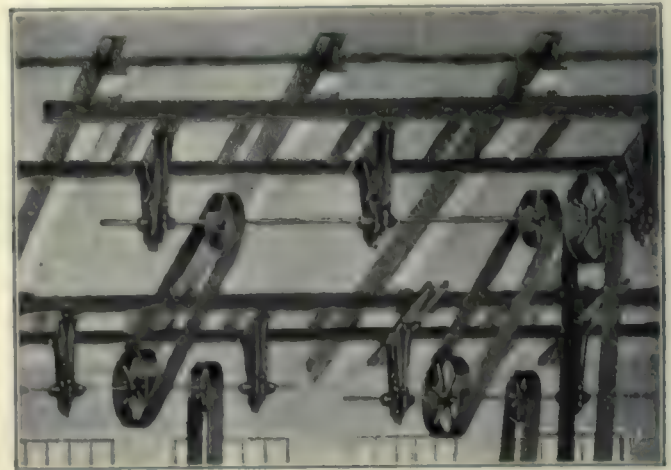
MIDWEST STEEL STRINGERS CARRYING LINE SHAFTING
